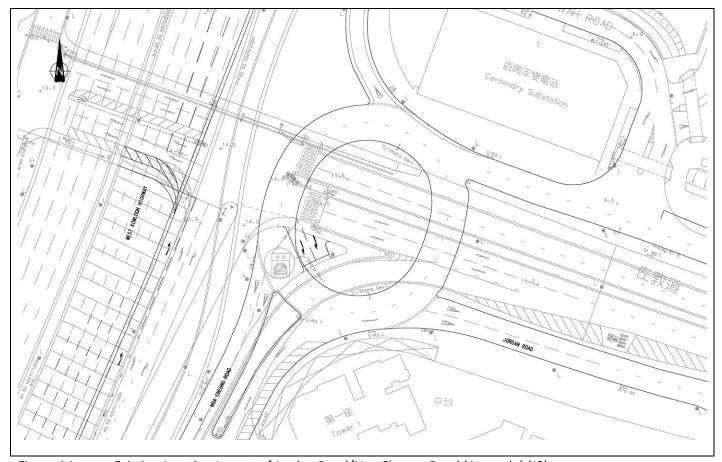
Existing Junction Layout of Jordan Road/Nga Cheung Road (At-grade) (J9)
